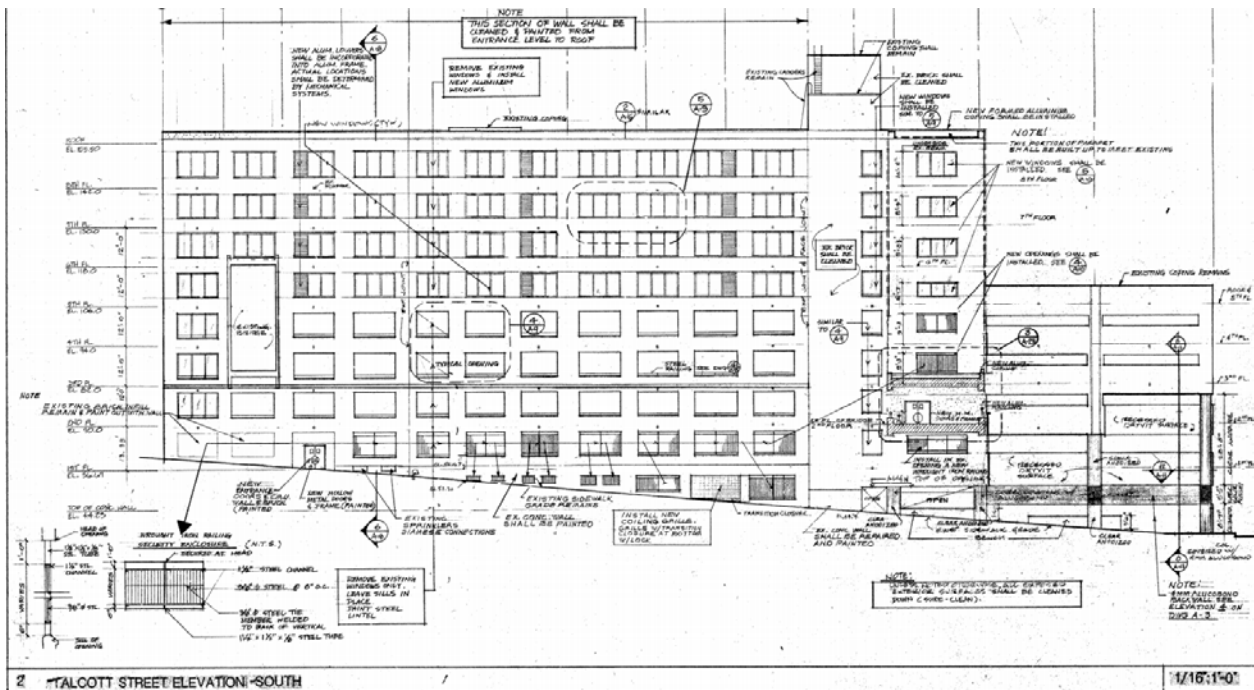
"Talcott Plaza" drawing set by Thomas Munroe Nicholes, AIA, & Associates, P.A. and Hallisey Engineering Associates. Printed April 23, 1986. This Talcott Street elevation is from plans with a handwritten
